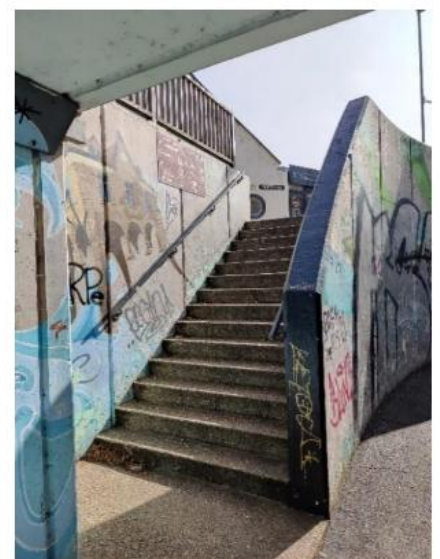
Stairs from Crescent Bridge Subway East Underpass
